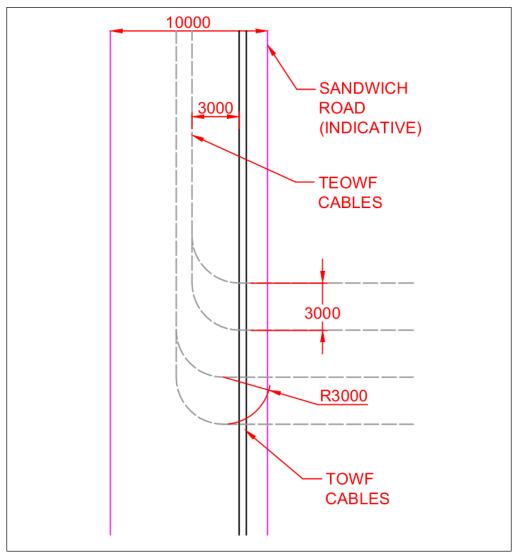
Indicative plan arrangement of TOWF Crossing 2 [6]
